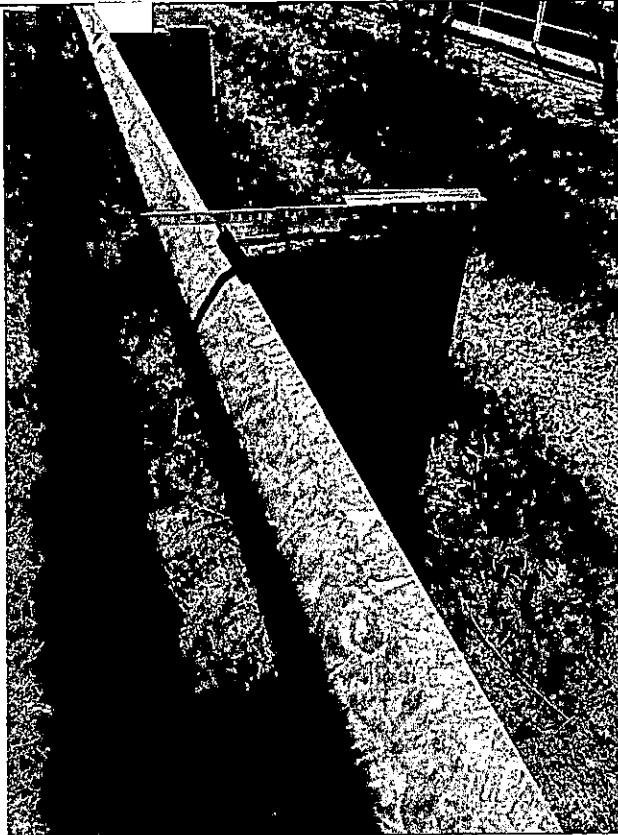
DESCRIPTION	SOUTHWEST BRIDGE RAILING WEST ELEVATION
